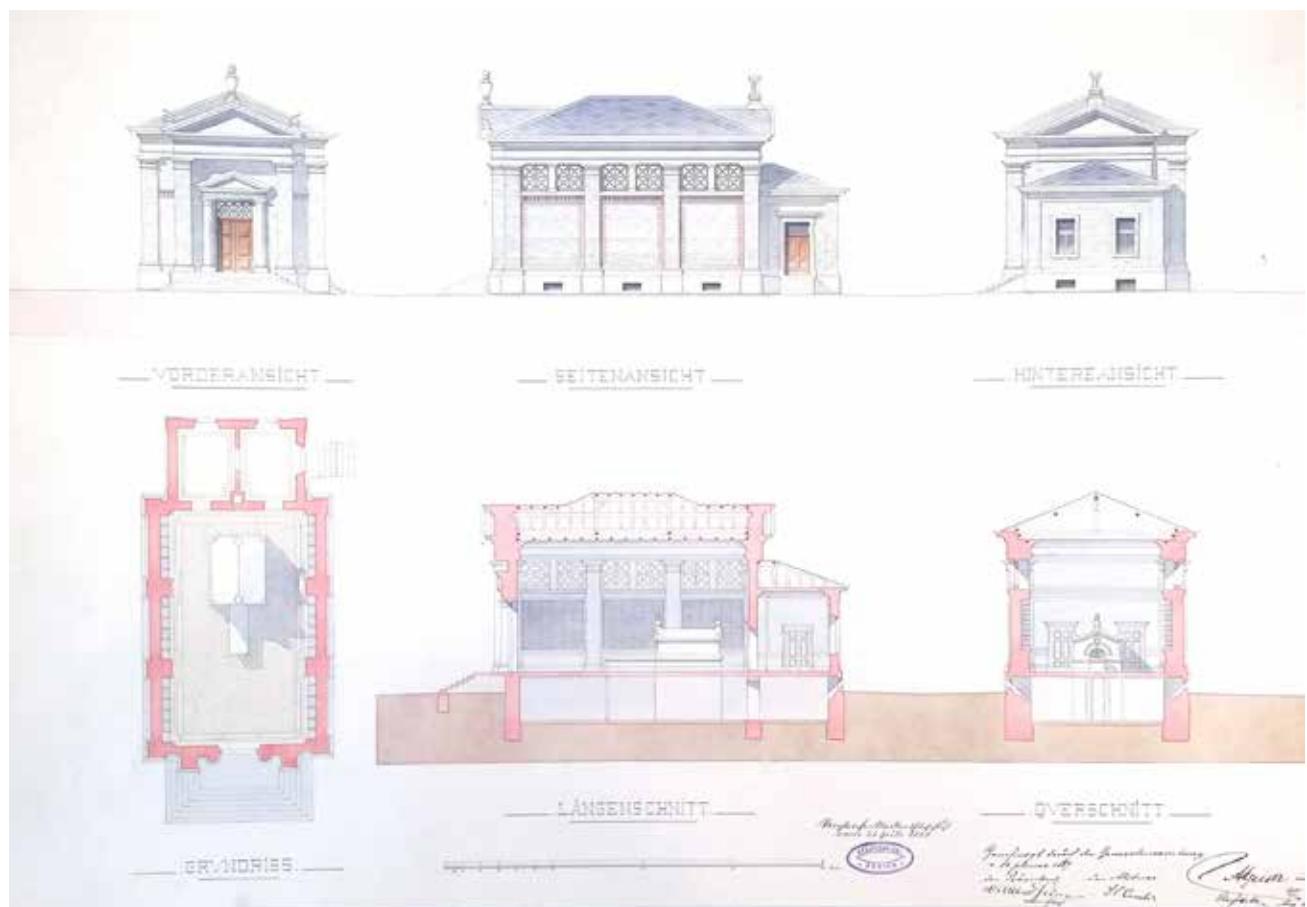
Crematory Plans. Archive Stadt Zurich (1877). [Plans]
